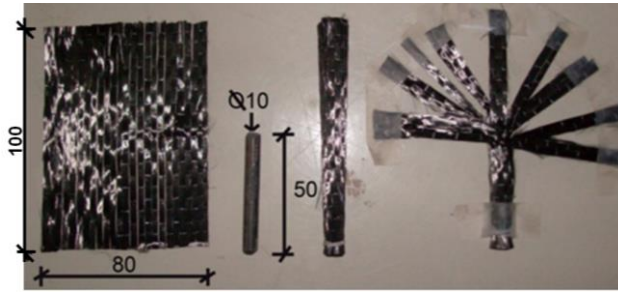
Fan type anchor dimensions and detail (Dimensions in mm.)
